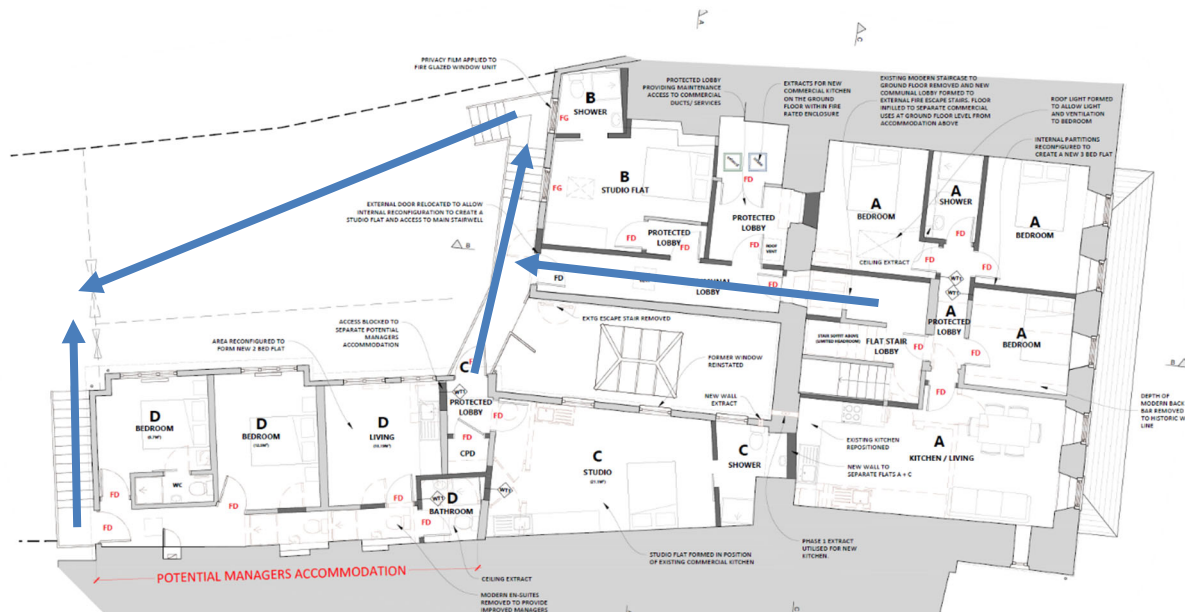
Proposed first floor plan - flood escape routes marked in blue
